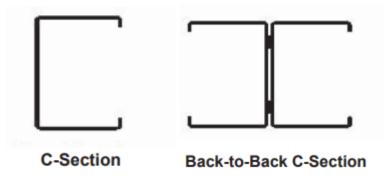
Section of CFS studs; C-Section (left); and back-to-back C-section (right) (NAHB, 2003)
